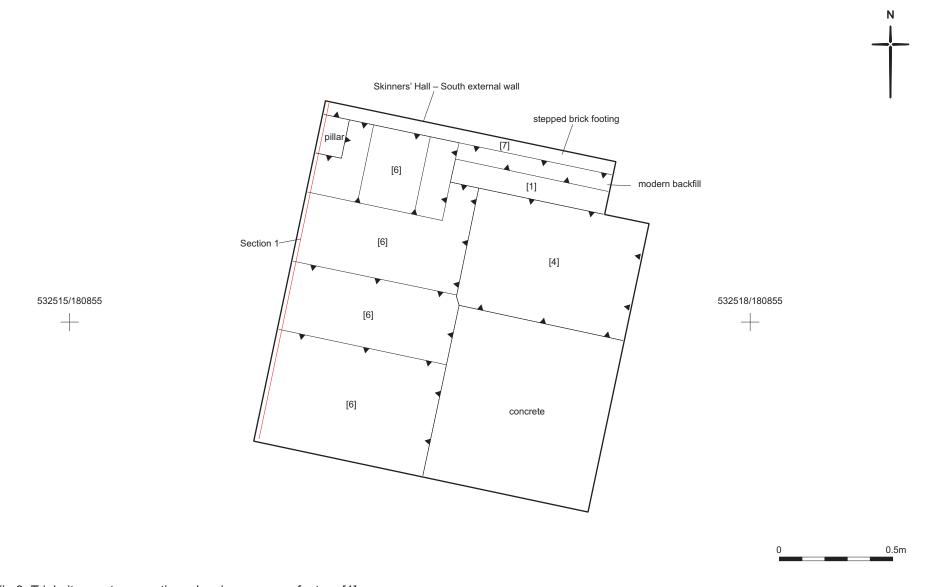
Trial pit – post-excavation, showing masonry feature [1]
